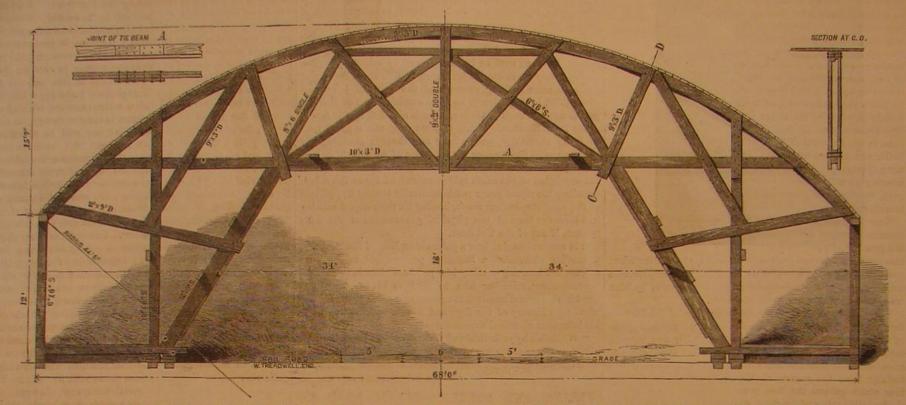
THE UNDERGROUND RAILWAY IN NEW YORK .- CENTERING OF THE GREAT ARCH, FOURTH AVENUE, NEAR 95th STREET.
